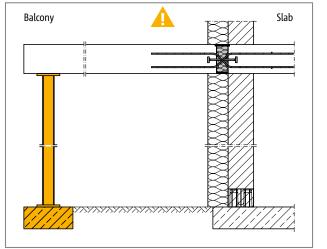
Schöck Isokorb® T type Q-PZ: Tie member connection
